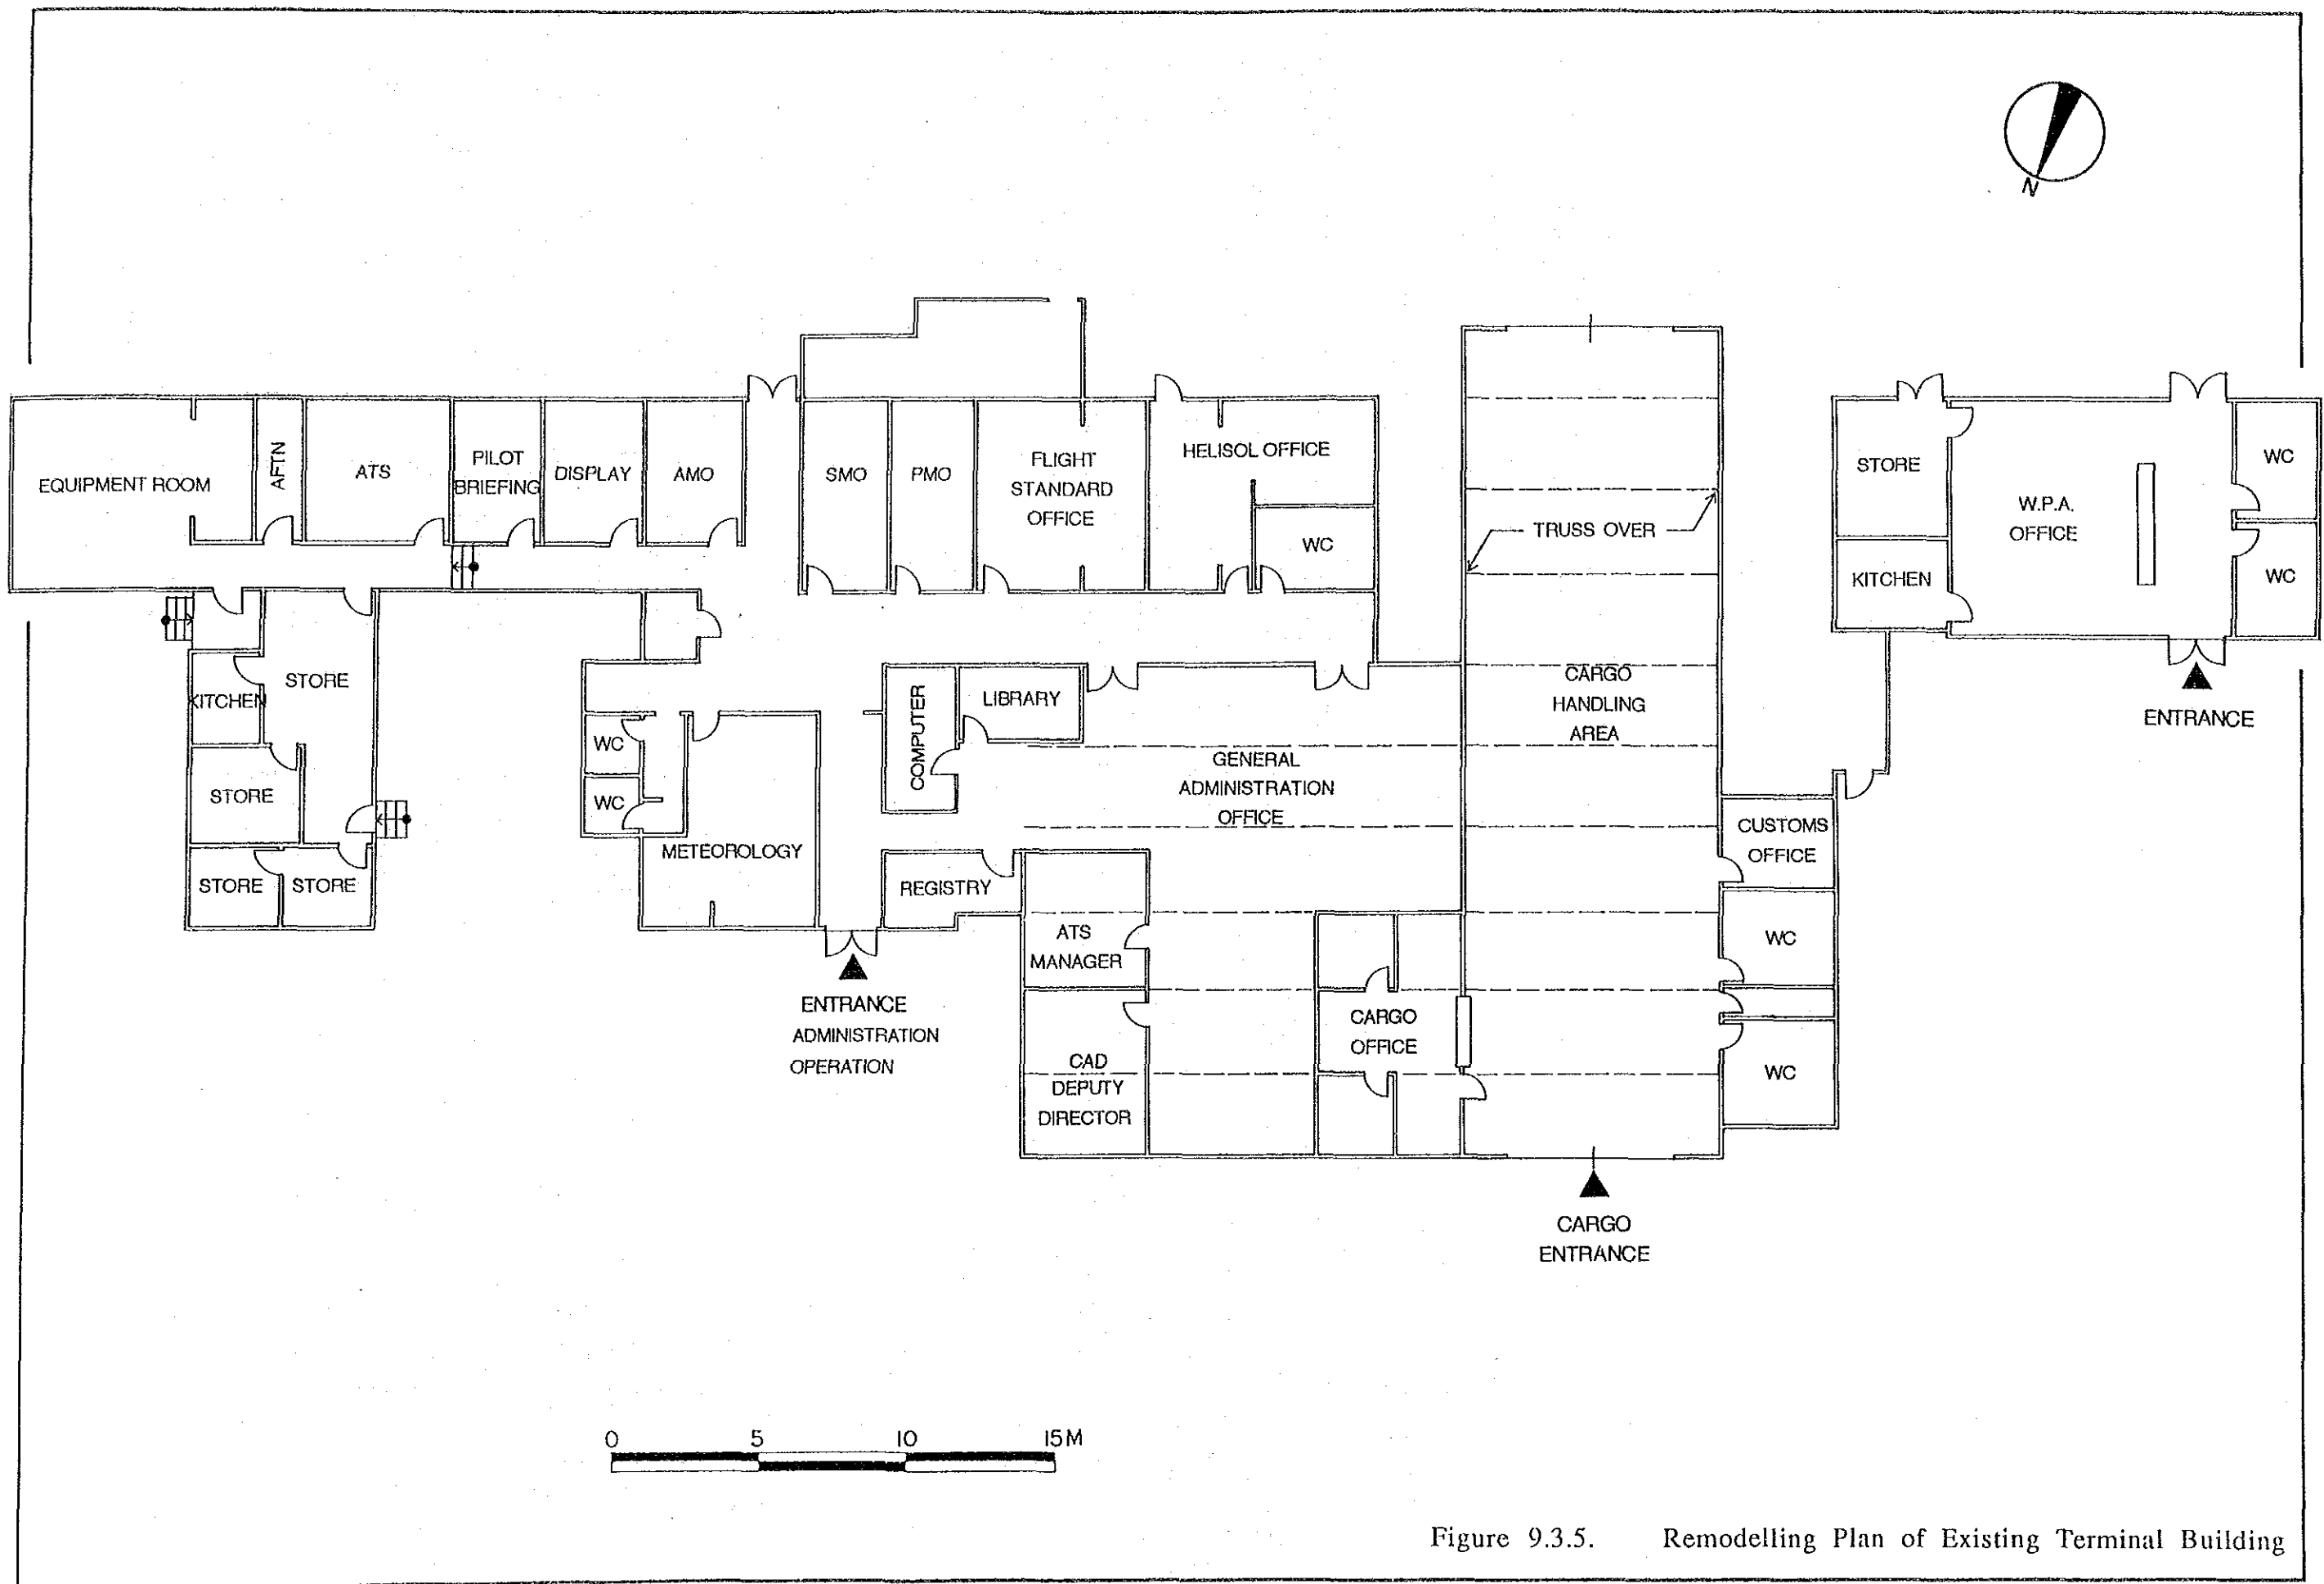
Remodelling Plan of Existing Terminal Building
